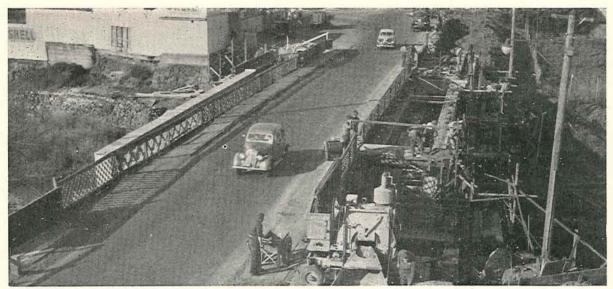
Replacing Old Bridge over Merri Creek in Bell Street, Cities of Coburg and Preston.
